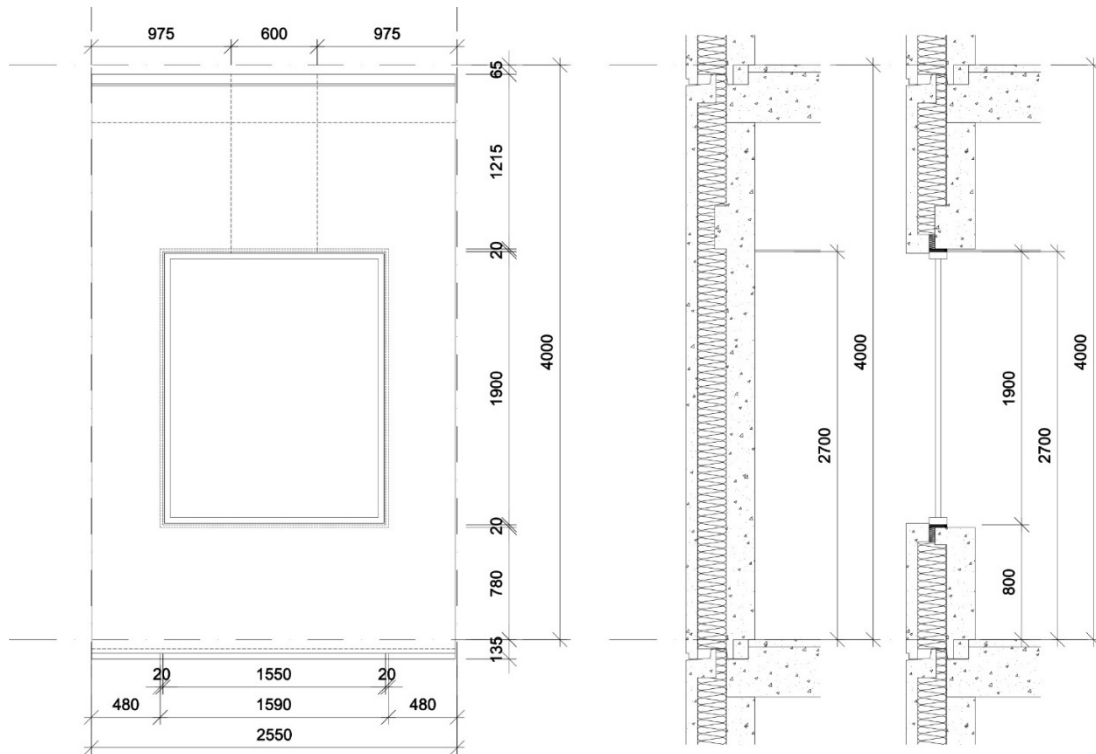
The elevation (left) and sections (right) of the insulated concrete sandwich panel used in this study.
